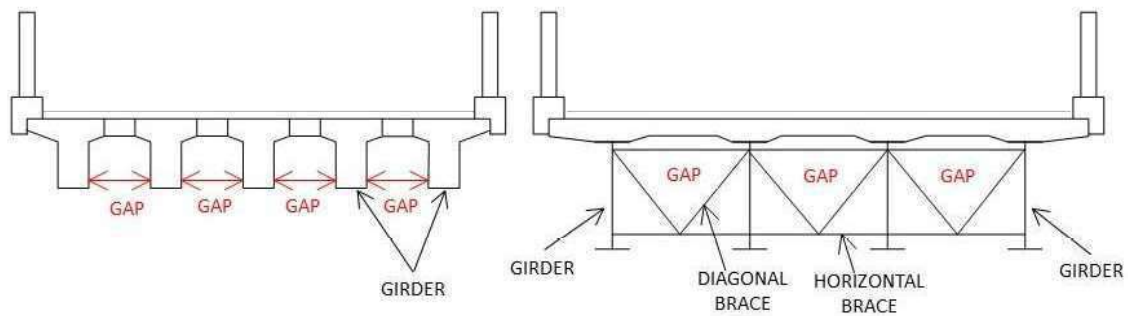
A cross-sectional view of concrete (left) and steel (right) type girder bridges.
